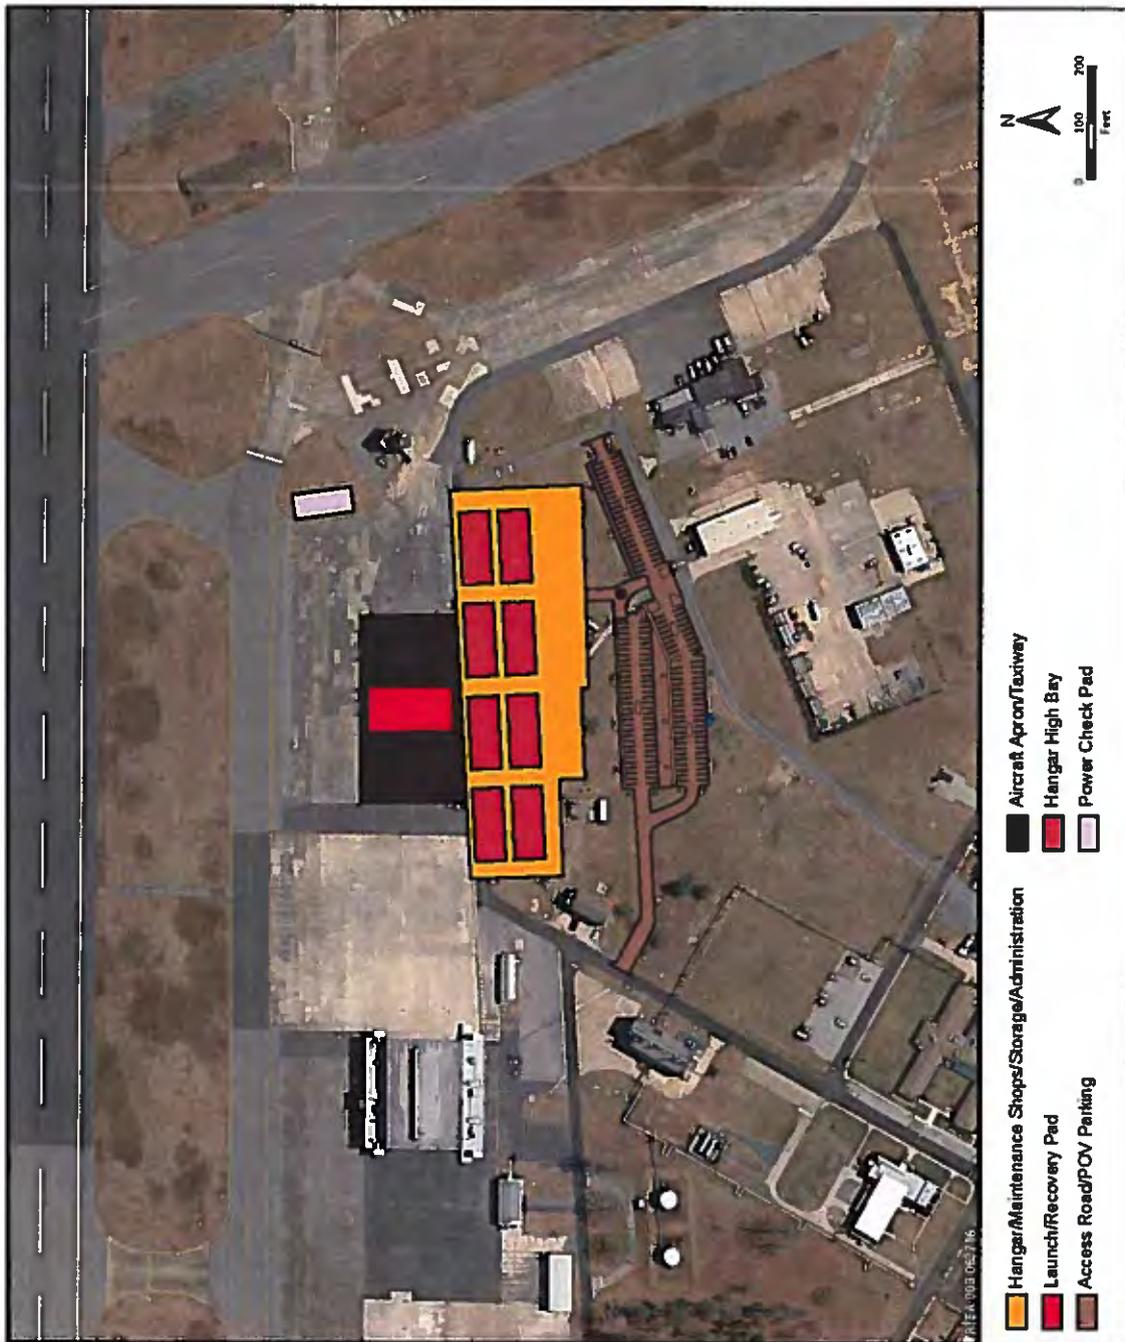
Wallops Flight Facility: Proposed Construction and Infrastructure Improvements
